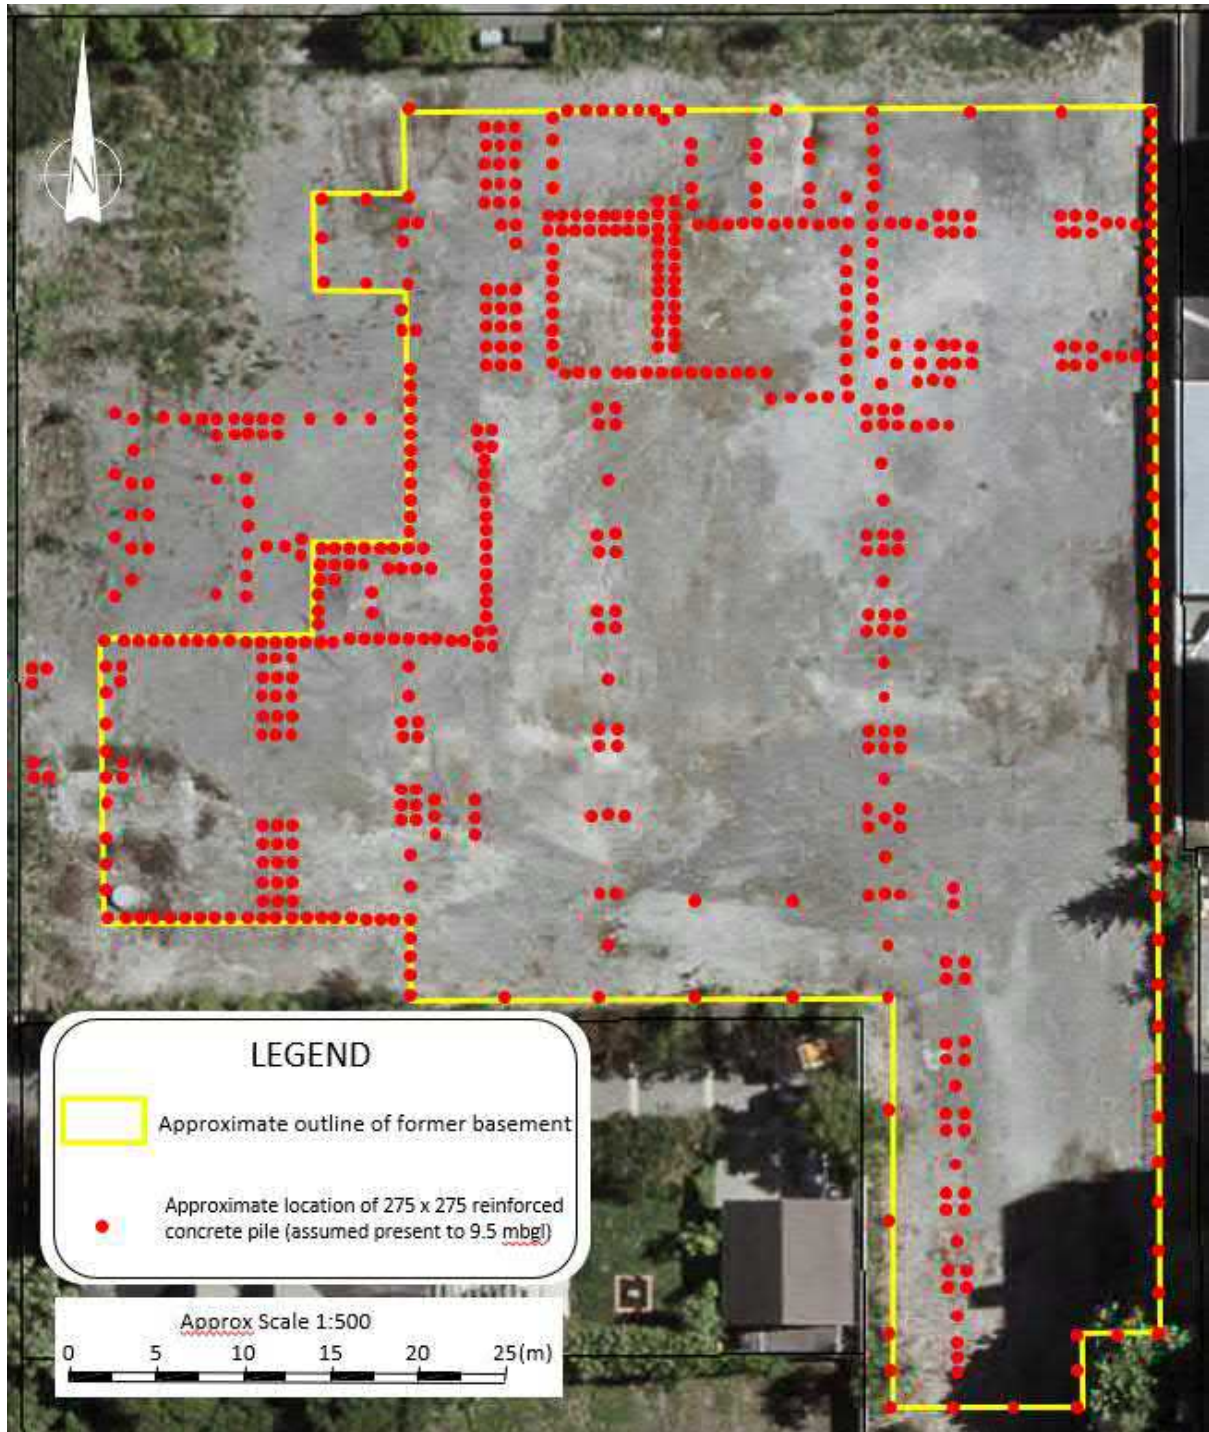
Approximate location of the precast concrete piles at the Peterborough site.
